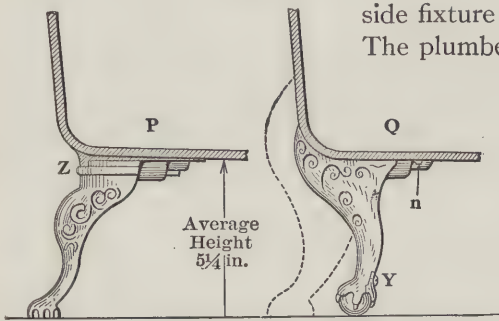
BATH HEAD SLANTS; BOTTOM "FALL," AND BASE CASTINGS
